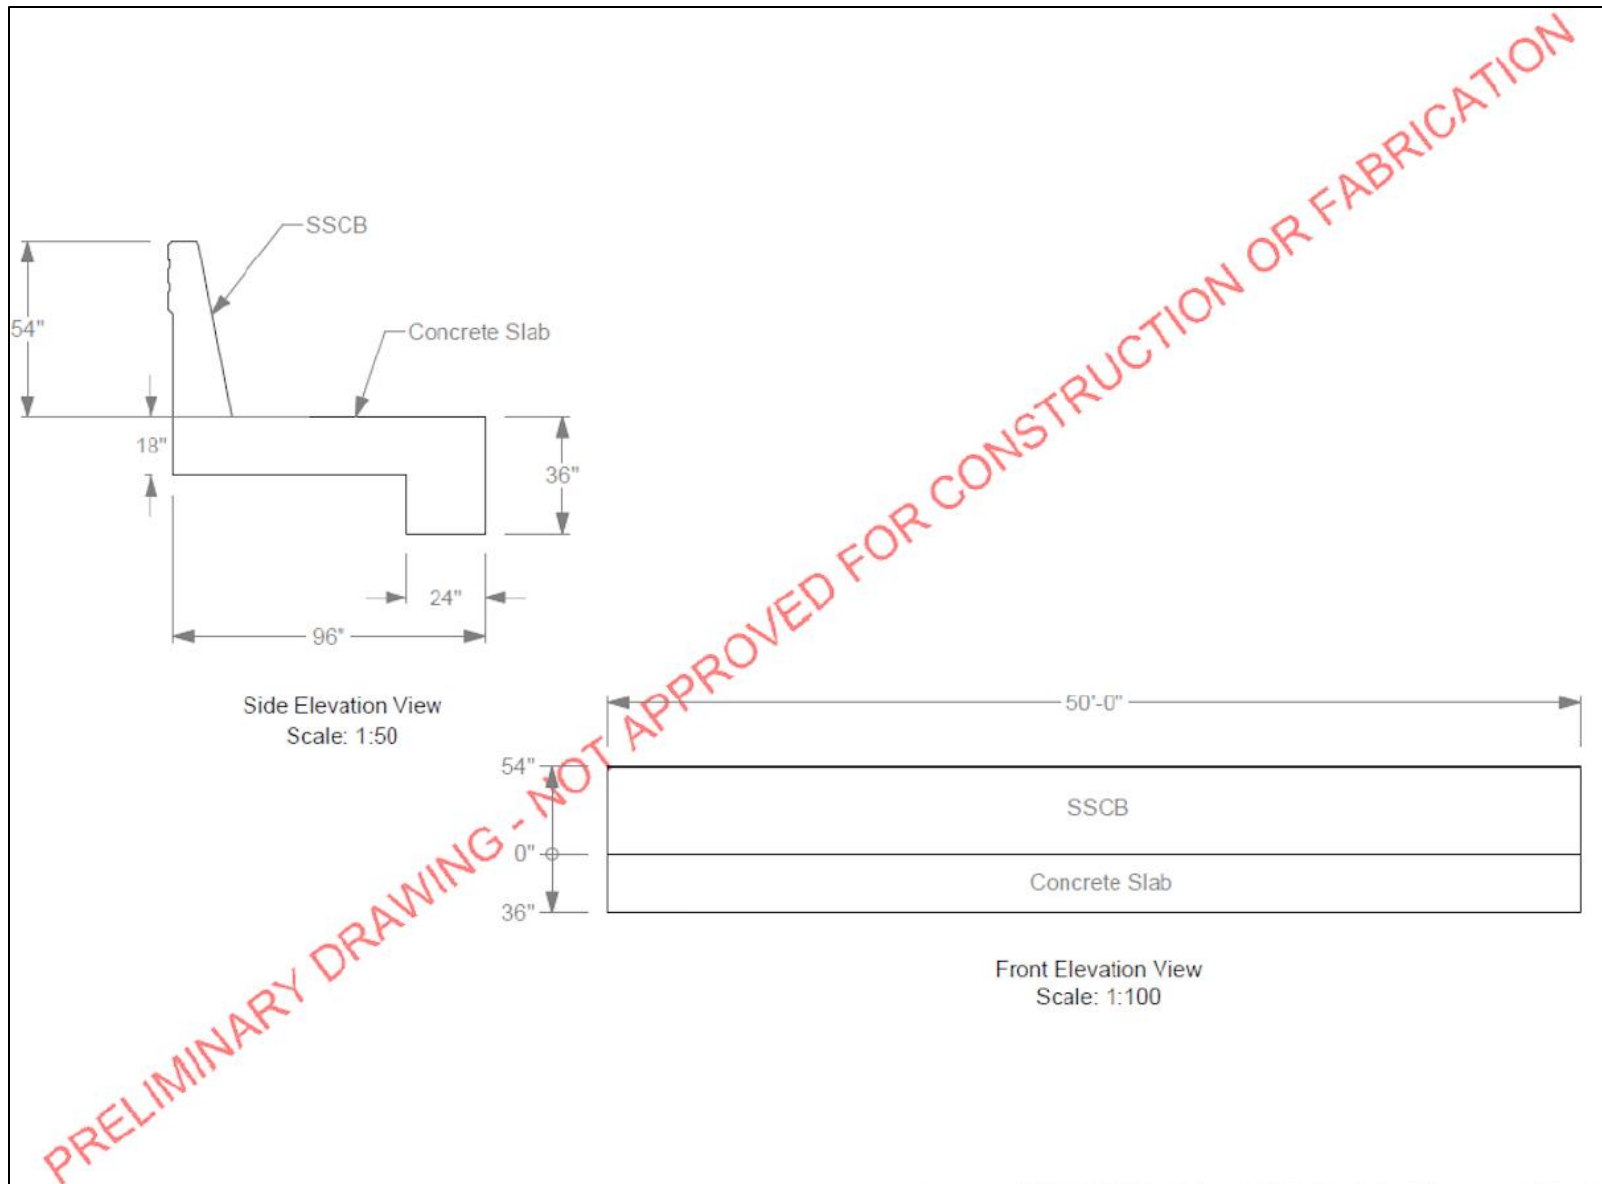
Design Concept 6 – Moment Slab with Concrete Beam Design (TTI, 2017)
